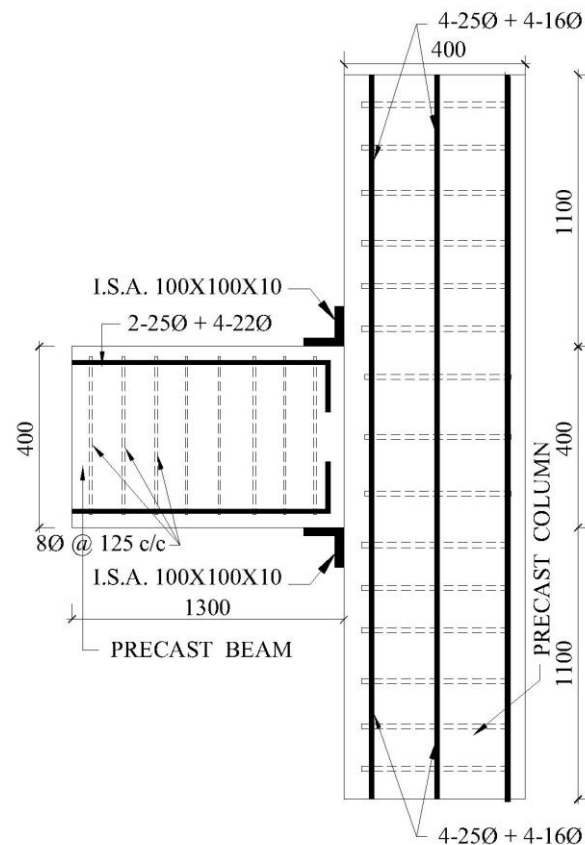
Side elevation of precast specimen P.C.-2
